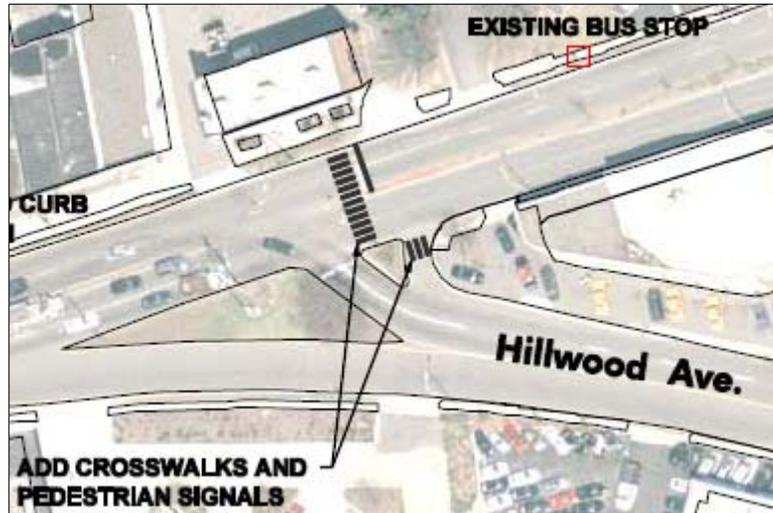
Short-term Recommendations for Hillwood Ave. Intersection
